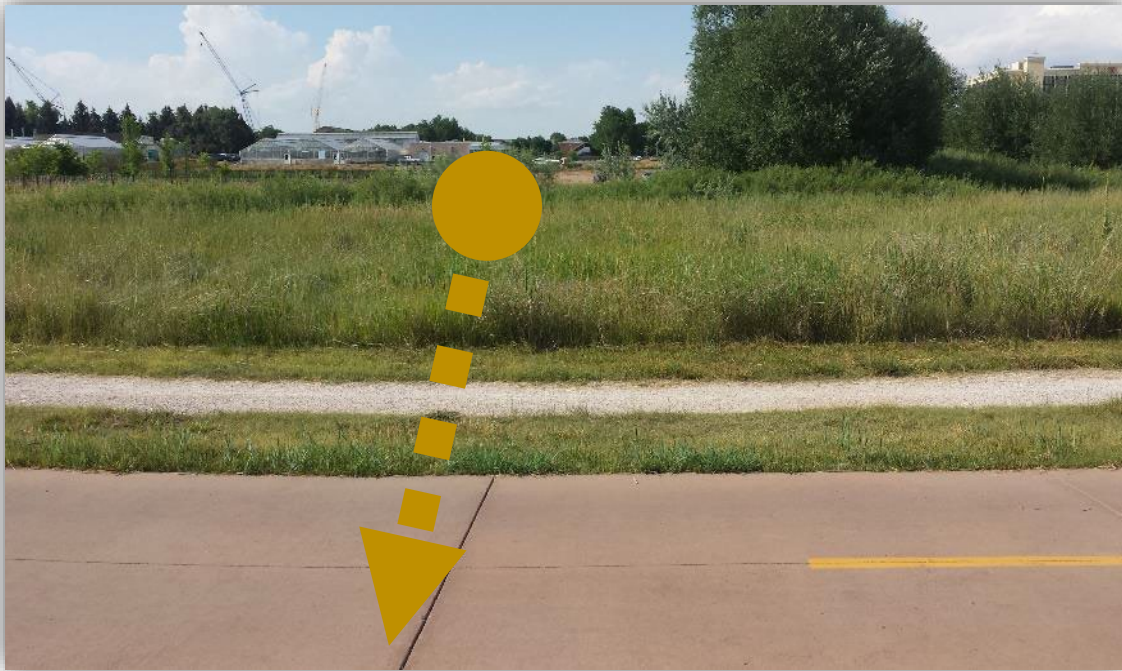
Spring Creek Trail @ The Gardens at Spring Creek - Looking North towards Horticultural Center - Phemister Trail will terminate at entrance to The Gardens at Spring Creek Great Lawn.
